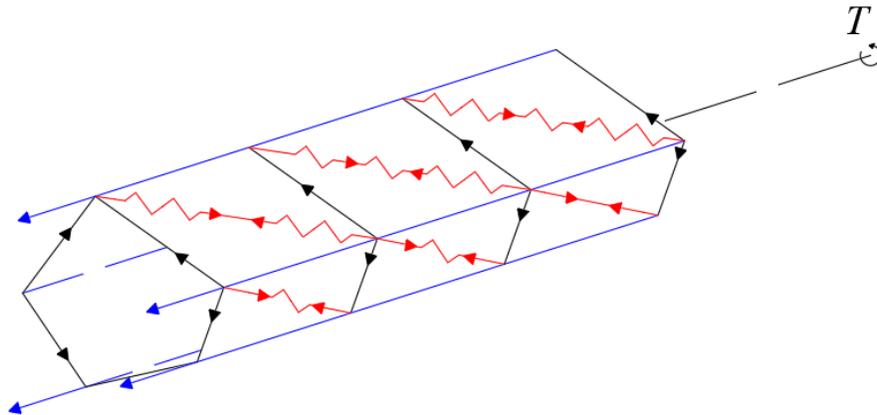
Space truss analogy for an asymmetrical beam under torsion. The tension forces are supported by the longitudinal and transverse reinforcement (black and blue) and the concrete struts resist compression (red)
